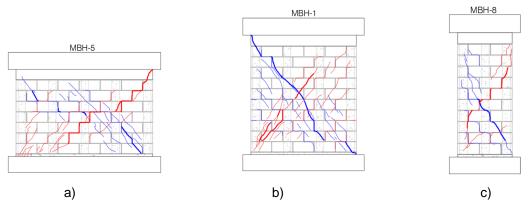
Cracking patterns for walls MBH-1, MBH-5 and MBH-8
